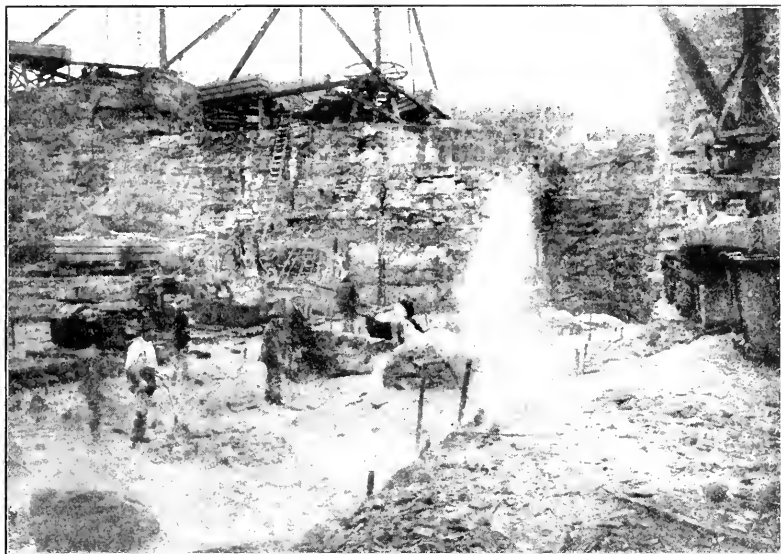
GROUTING SEAM IN ROCK, 60 FT. BELOW THE CREEK BED, UNDER OLIVE BRIDGE DAM.
